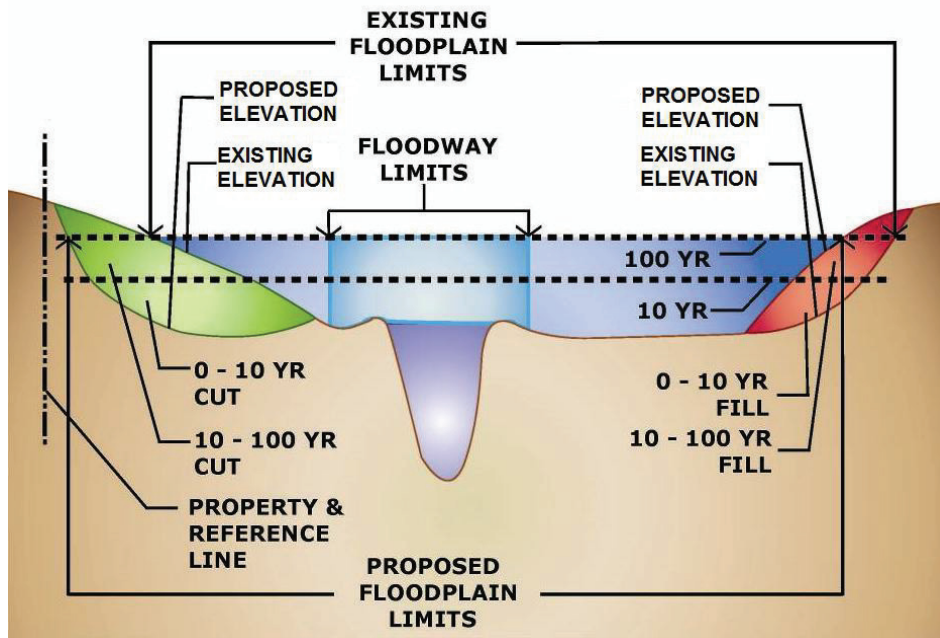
Cross-section D-D from the Compensatory Storage Plan provided in Figure 6.6
